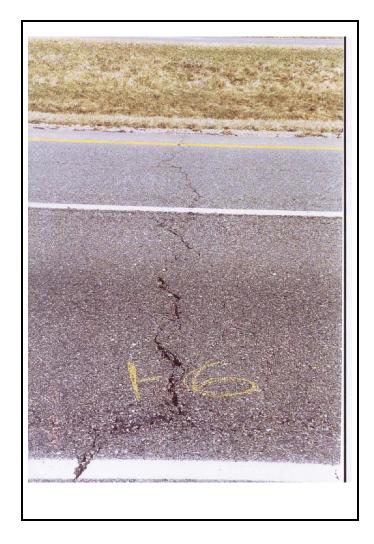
Unjointed Base, Transverse Cracking in Composite Pavement, High Severity
